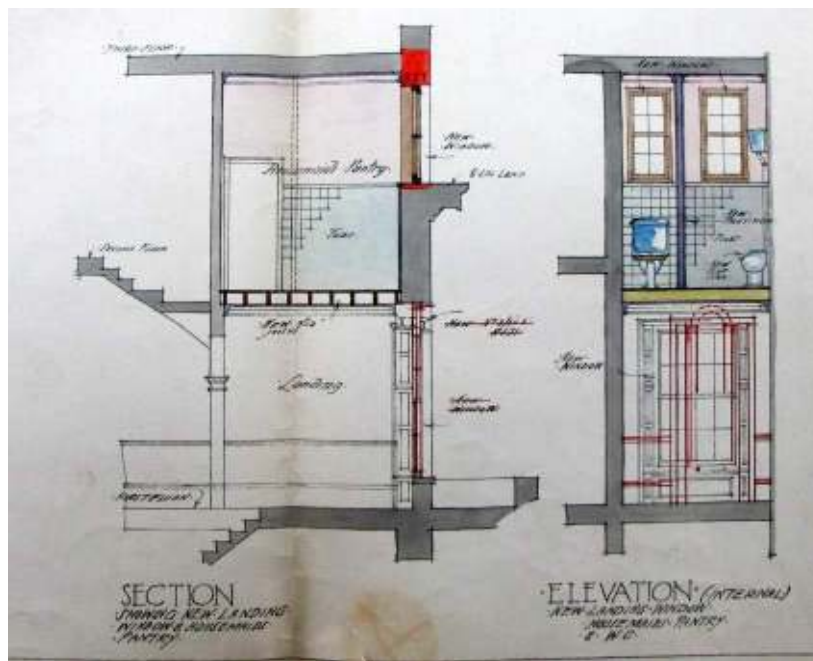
1925 – Proposed section showing alterations to the stairs/landing between the first and second floors.
